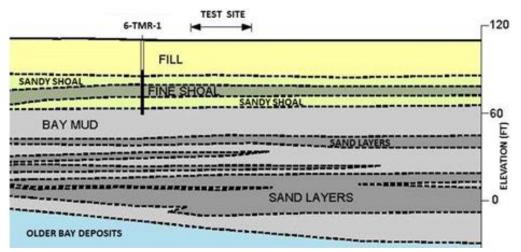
Test site geologic section. Elevation datum MLLW+100 feet. Horizontal scale 1inch = 100 feet
